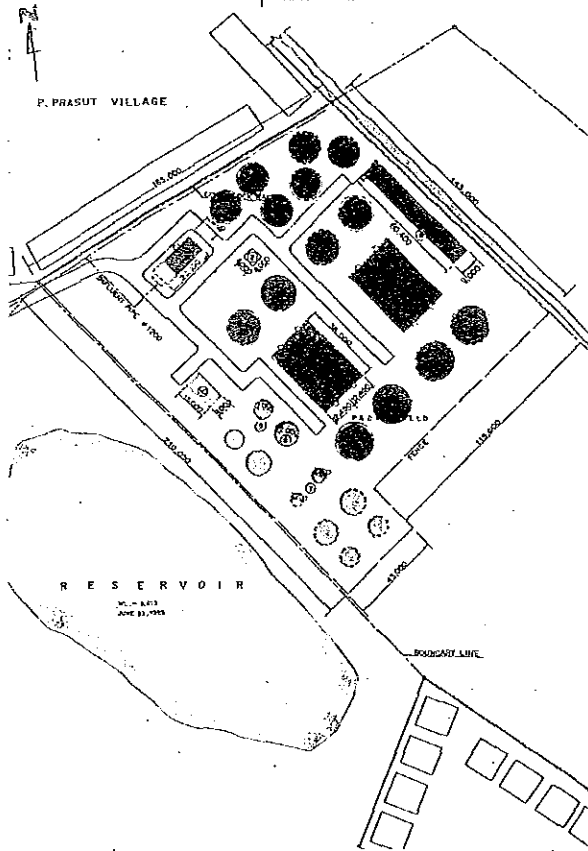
FIGURE Layout of Sewage Treatment 3. 16(a) Plant (Bang Bua Thong North)
